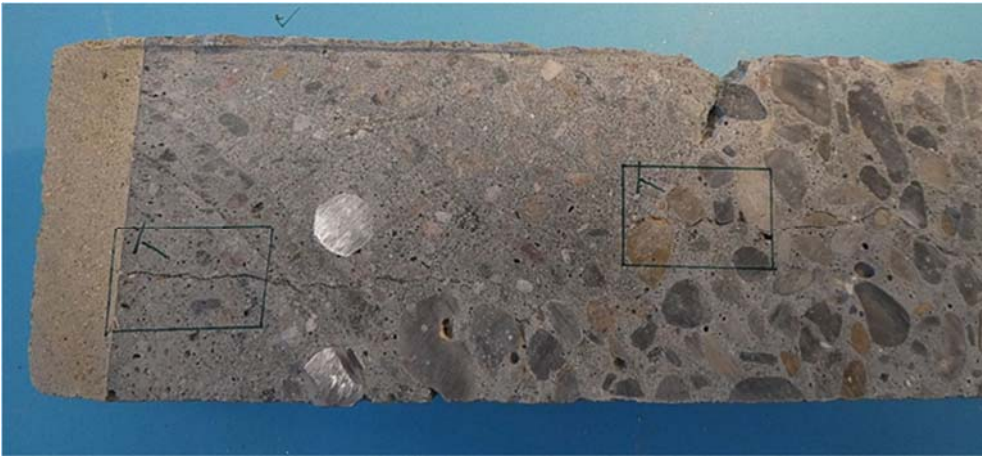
A concrete core from the roof has been cut in half in order to prepare for extraction of two thin sections (T).
